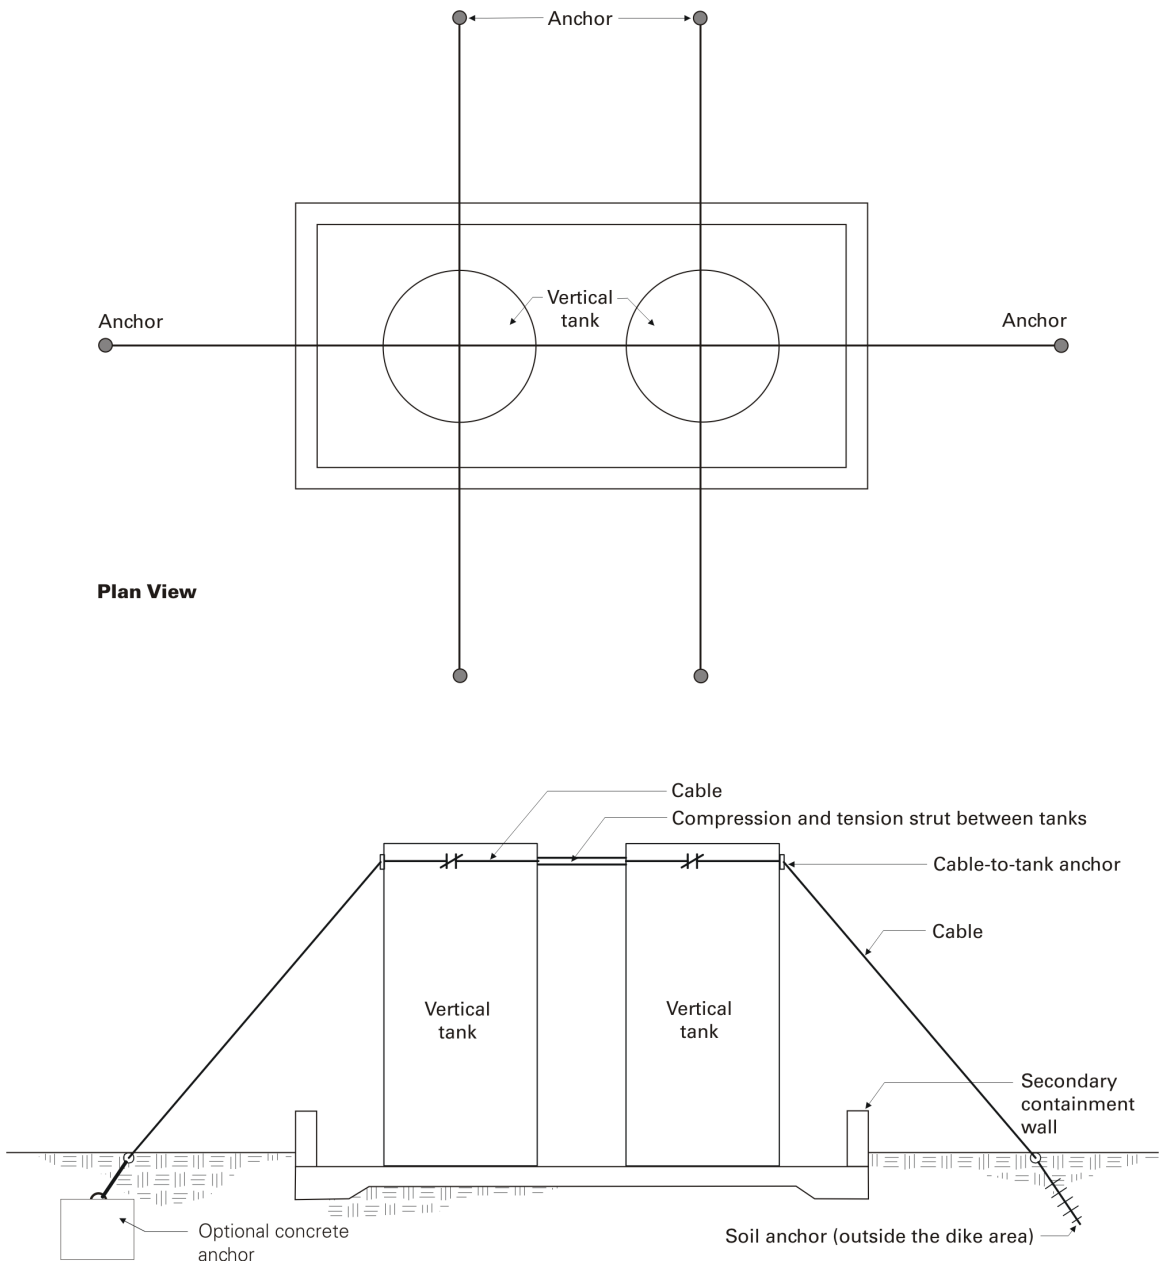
Cable anchors located outside the secondary containment structure for vertical tanks.
